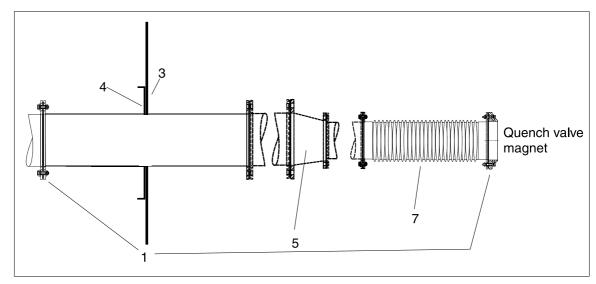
Quench tube, example of horizontal bellows and cabin feed-through
